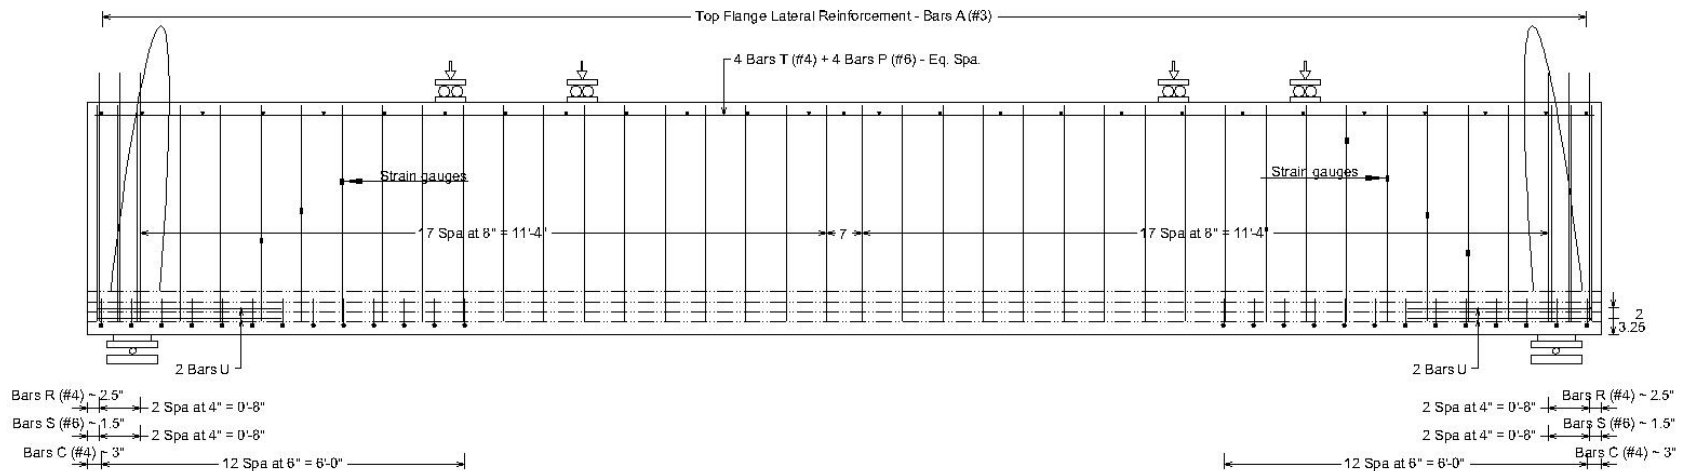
Detailed Longitudinal Cross-section for Girder G2
